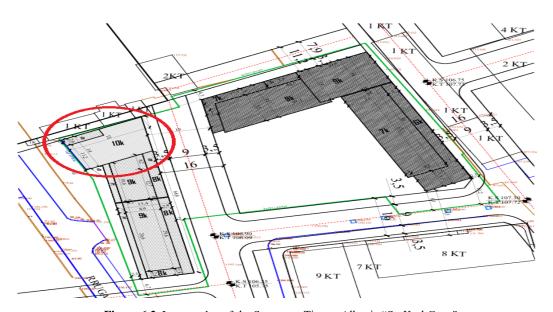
Layout plan of the Structure, Tirana, Albania "St. Karl Gega"
